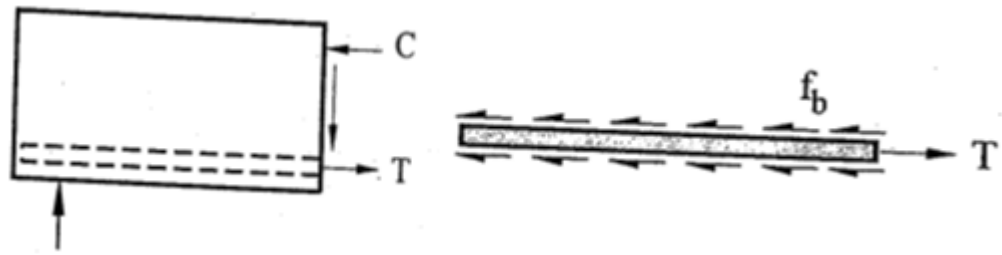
Force acting on a bar (source design reinforced concrete structure book)
